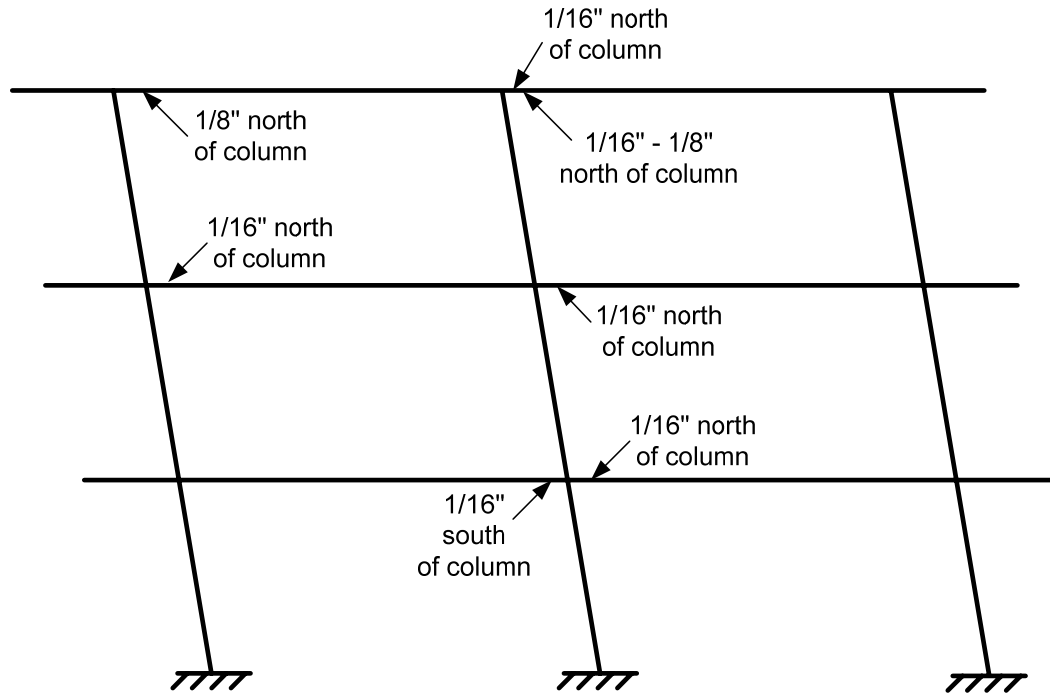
Vertical Slab Separation Frame A, South 3% Roof Drift
